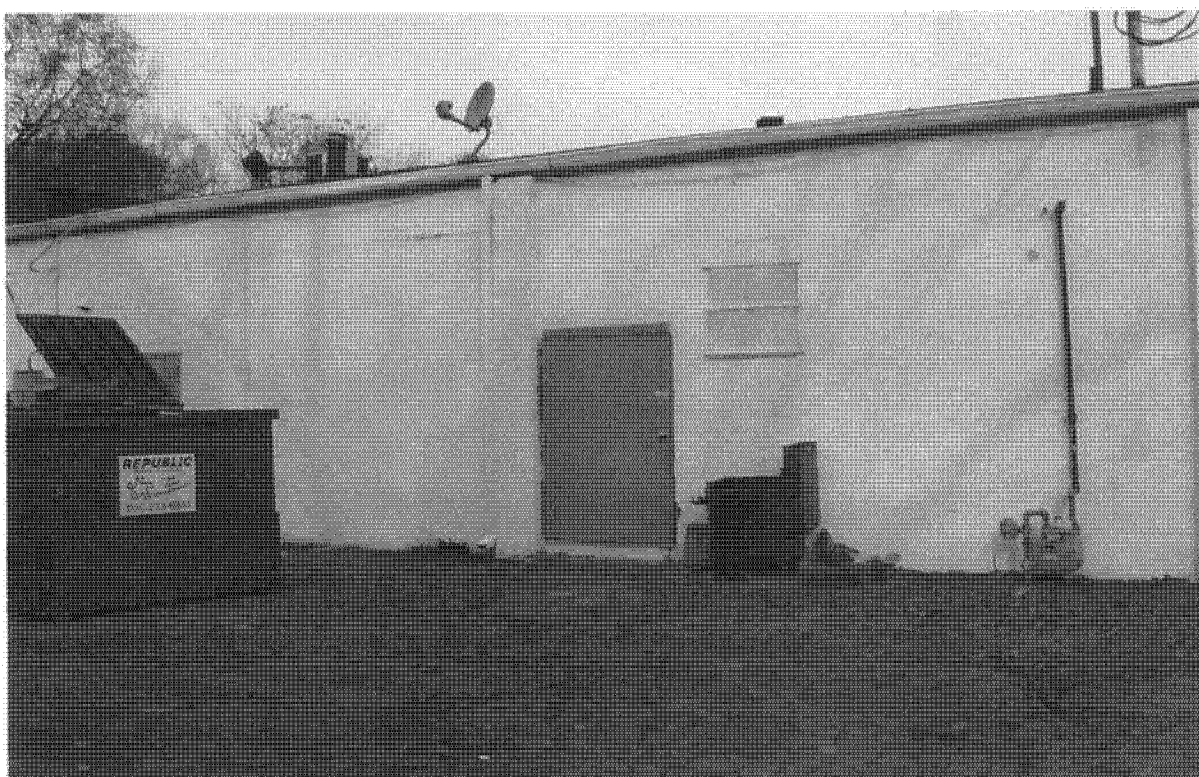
Backside of 3819 W. Michigan Street (dumpster, old cooker, gas line)
